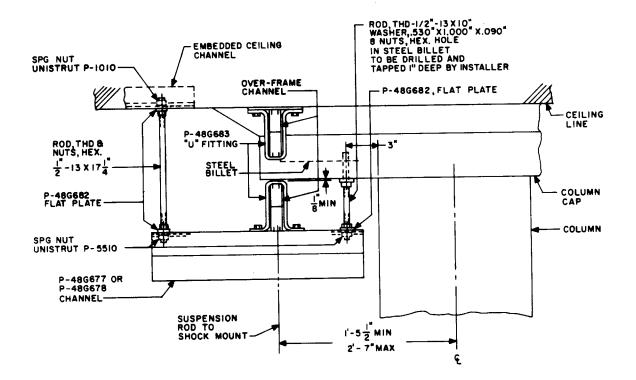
Fastening Overframe Channel to Embedded Ceiling Channel and Column Cap (A&M Only)
